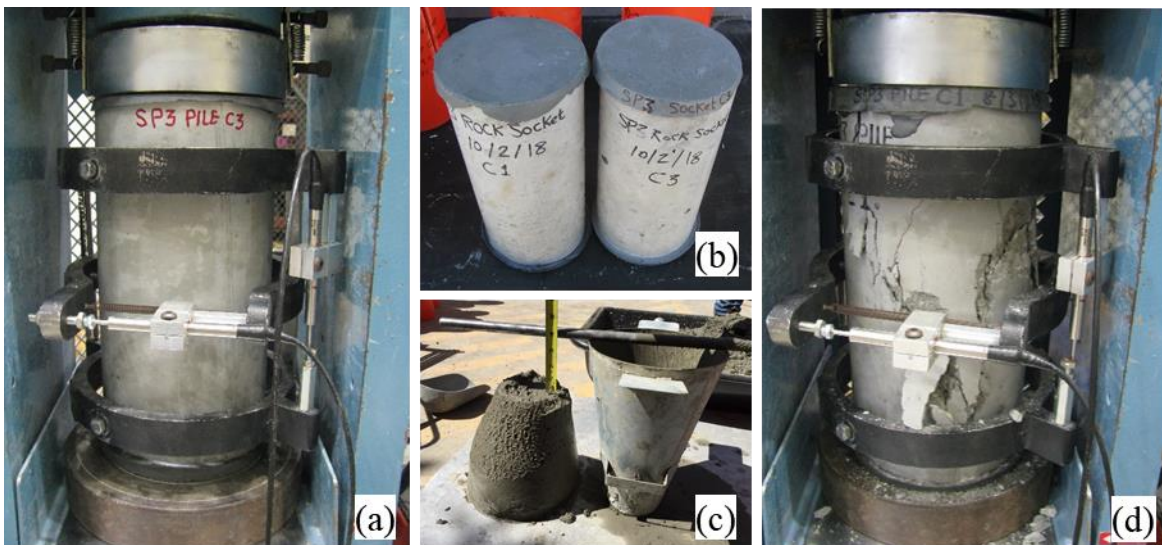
(a) Instrumented cylinder sample, (b) Capping of concrete cylinders with sulfur mortar, (c) Slump test (d) Concrete cylinder after test
